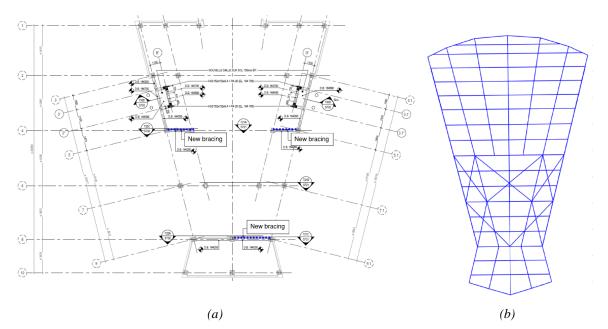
Implemented seismic retrofit: (a) New vertical tension-only X bracings, (b) New horizontal tension-only bracings layout under the roof.
